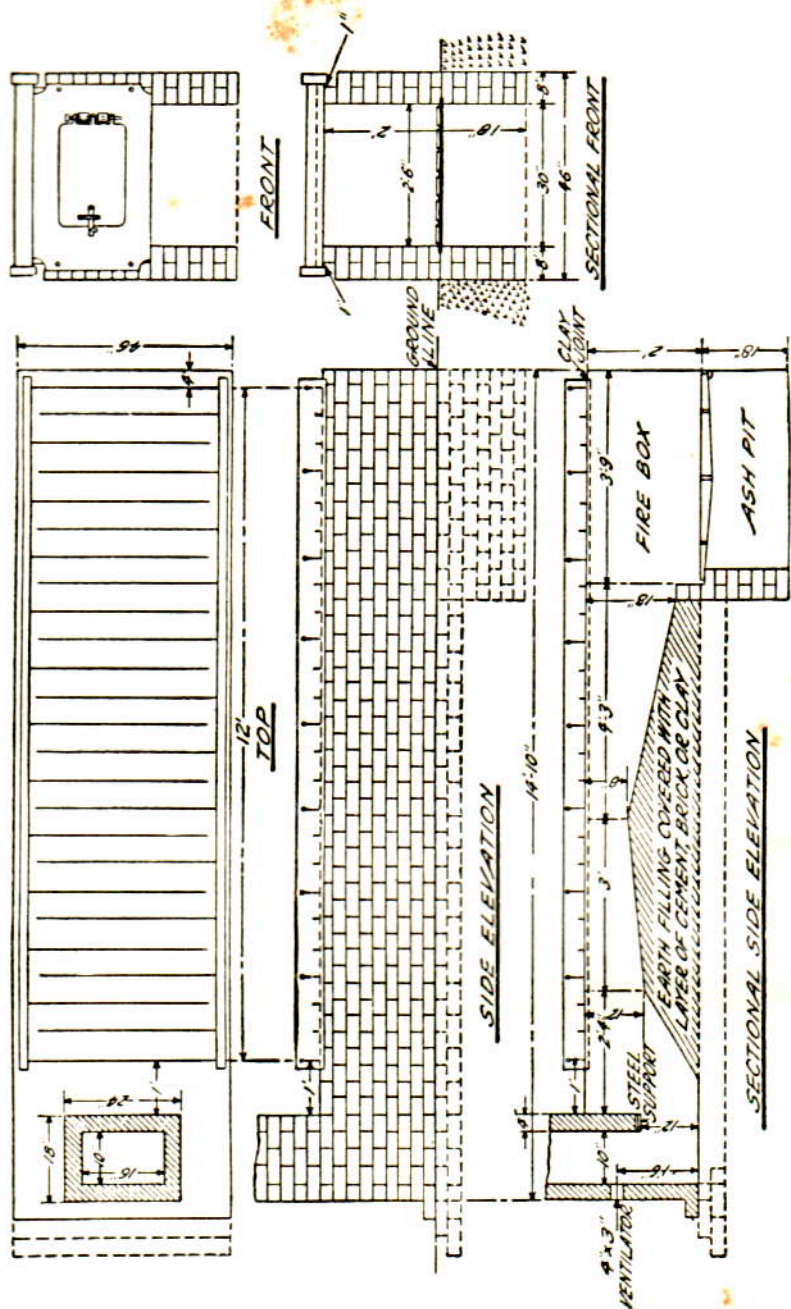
A 12-foot continuous evaporator and furnace.
